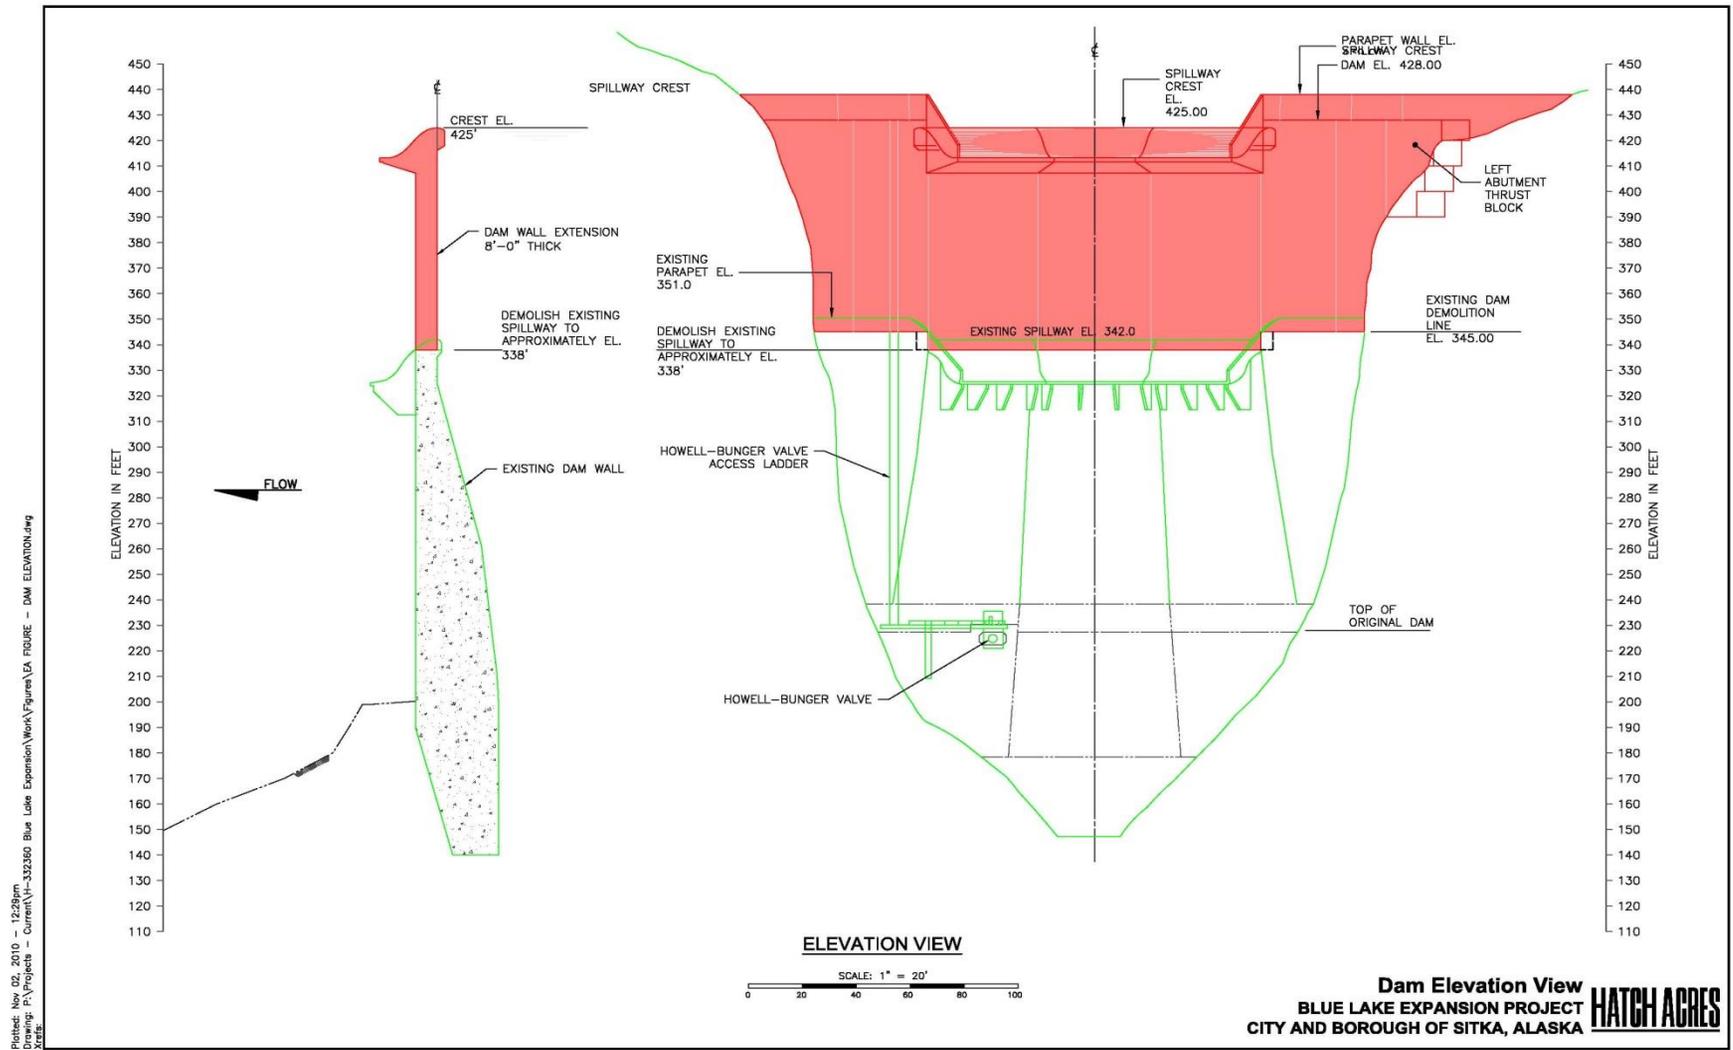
Elevation View of Existing and Expansion-Related Dam at El 425.
